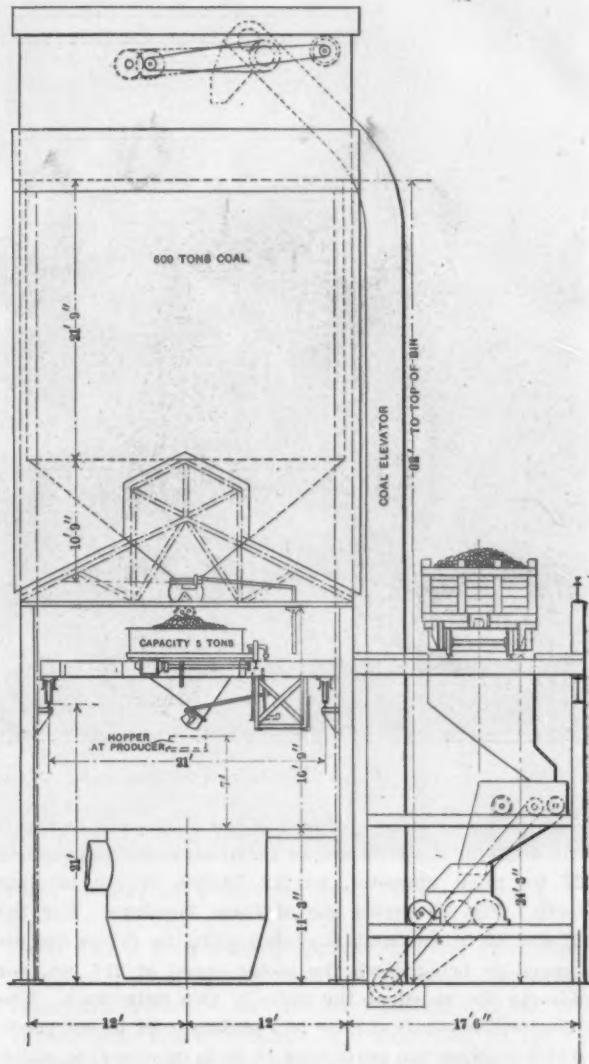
Sectional Elevation of the Coal Handling Equipment for the Gas Producers.
